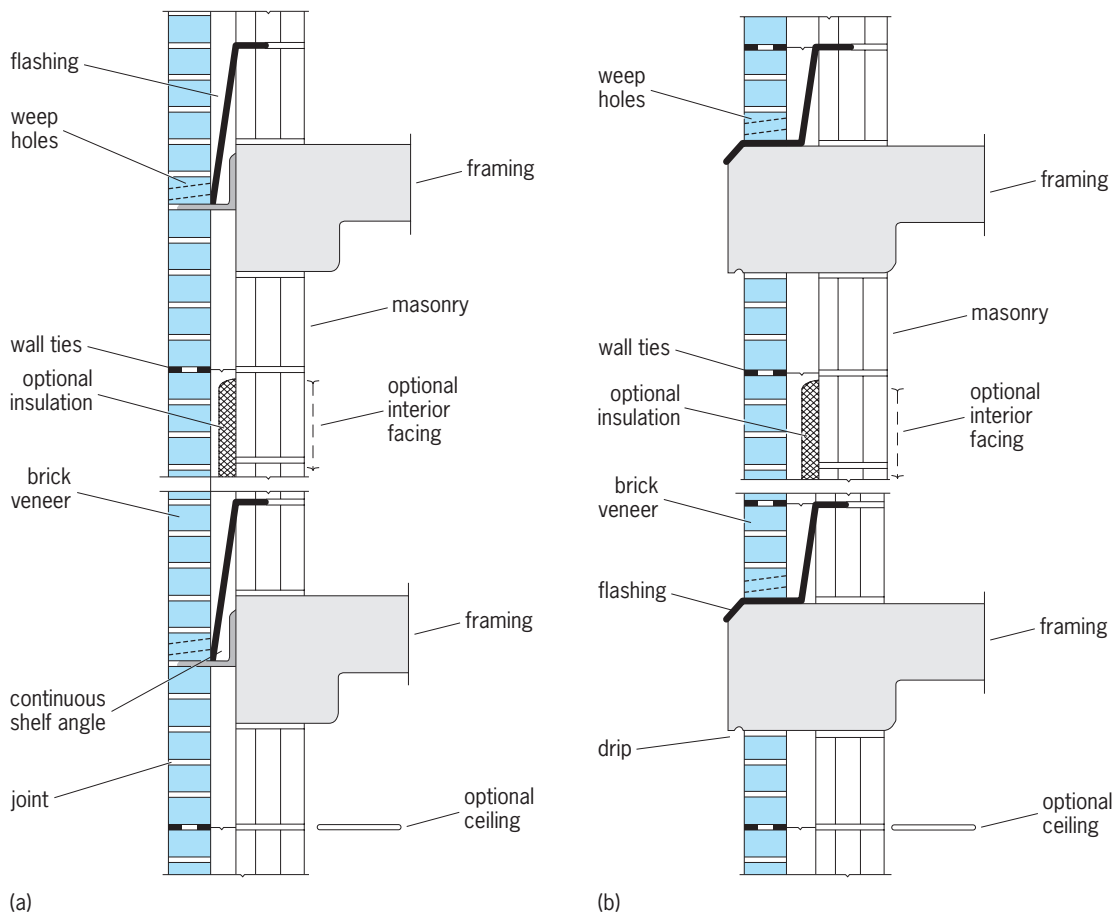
Details of some masonry wall construction. (a) Continuous veneer. (b) Interrupted veneer. (After Sweets Catalog File: General Building and Renovation, 1993)
